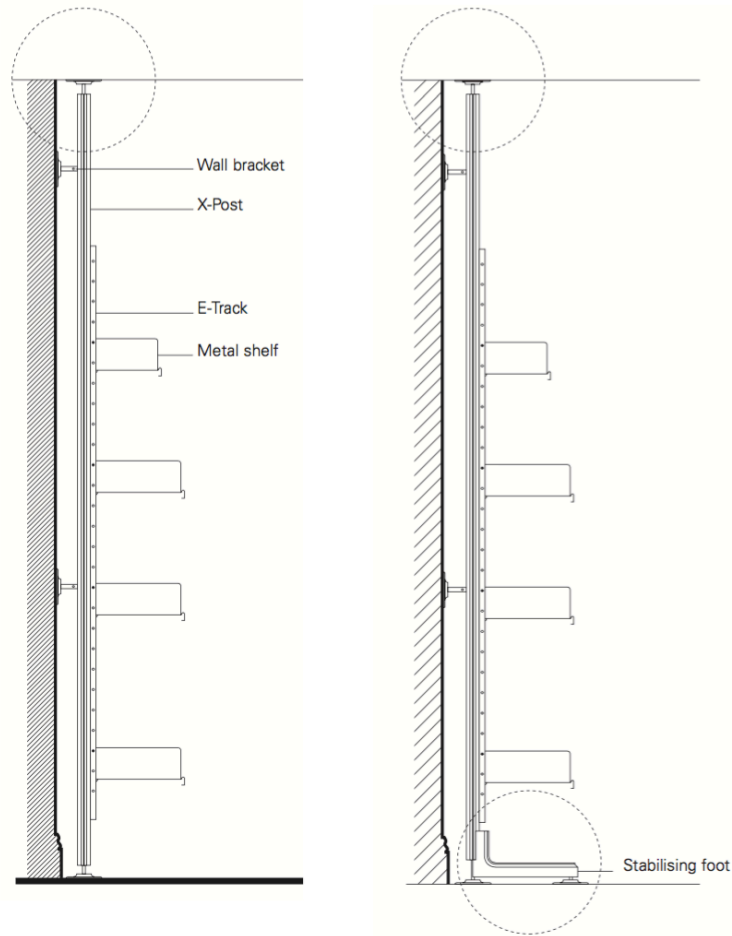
606 Universal Shelving System with the Floor/Ceiling Plate and Stabilising Foot in dotted circles
